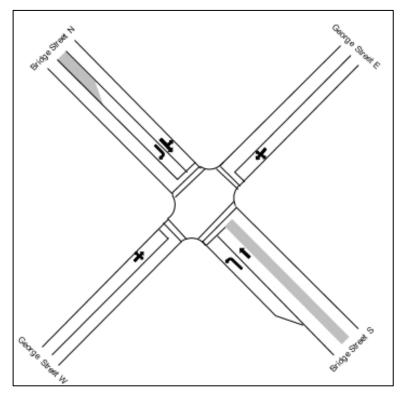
Approved layout of the Bridge Street and George Street intersection
